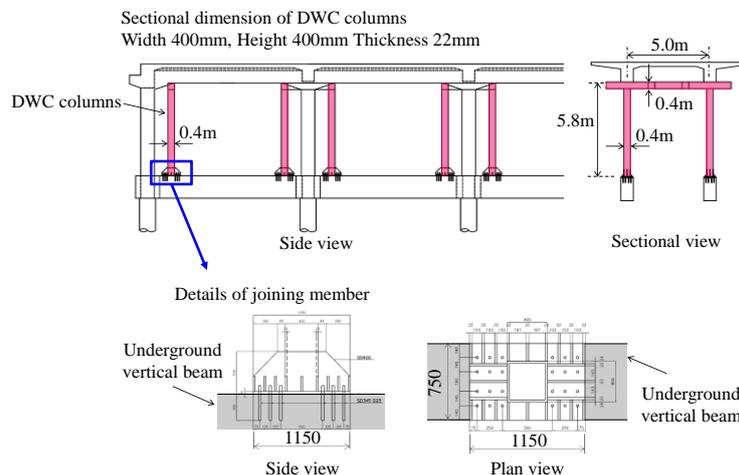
Structural specifications of the DWC columns installed in existing viaducts
